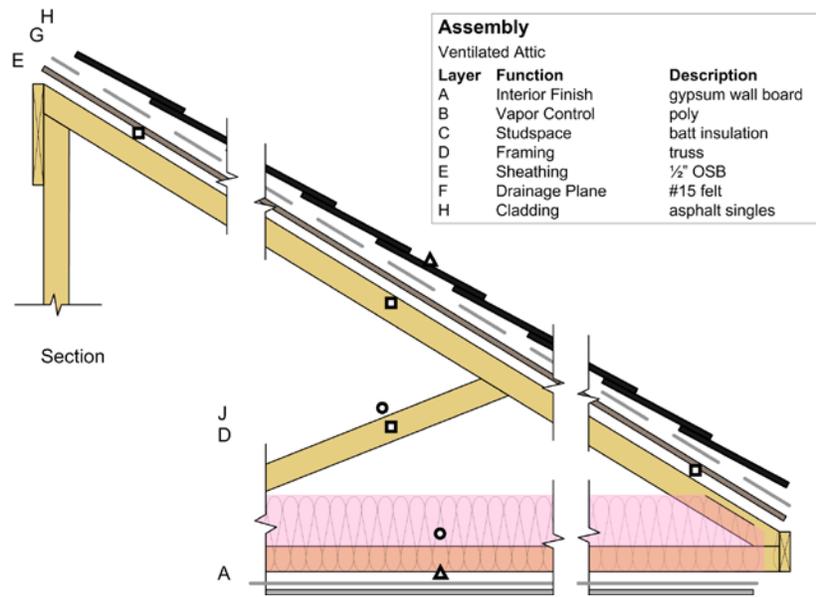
Coquitlam Test Hut Roof Study, Roof 1 – Ventilated Attic
